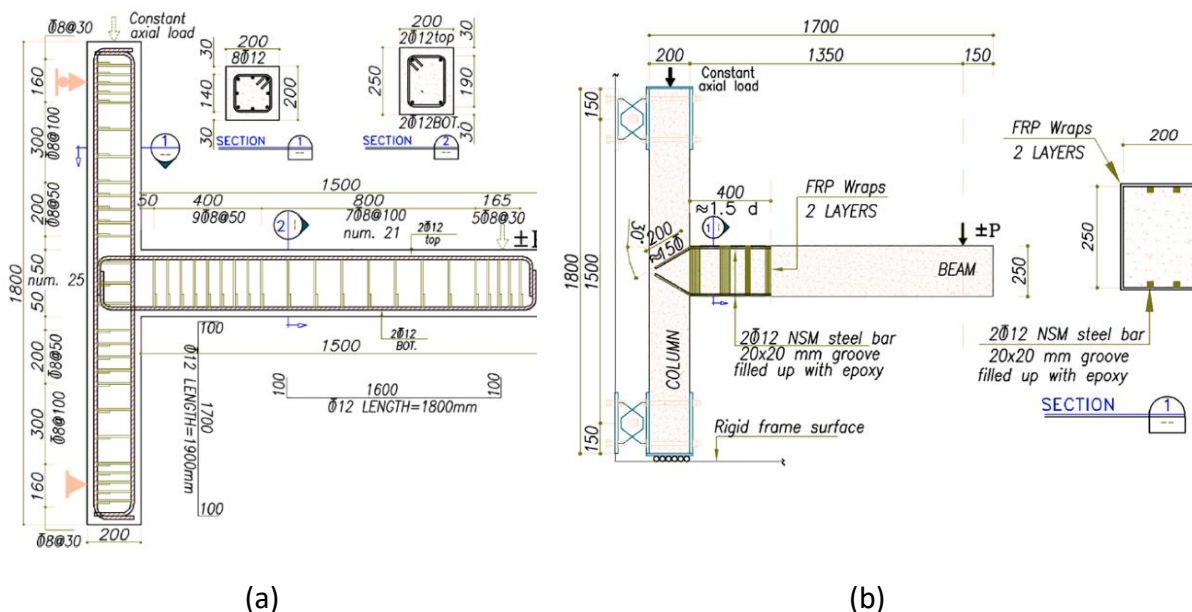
(a) Details of the reinforcement; (b) RS-SJ-FW specimen retrofitting details (Hashemi and Riahi, 2022).
